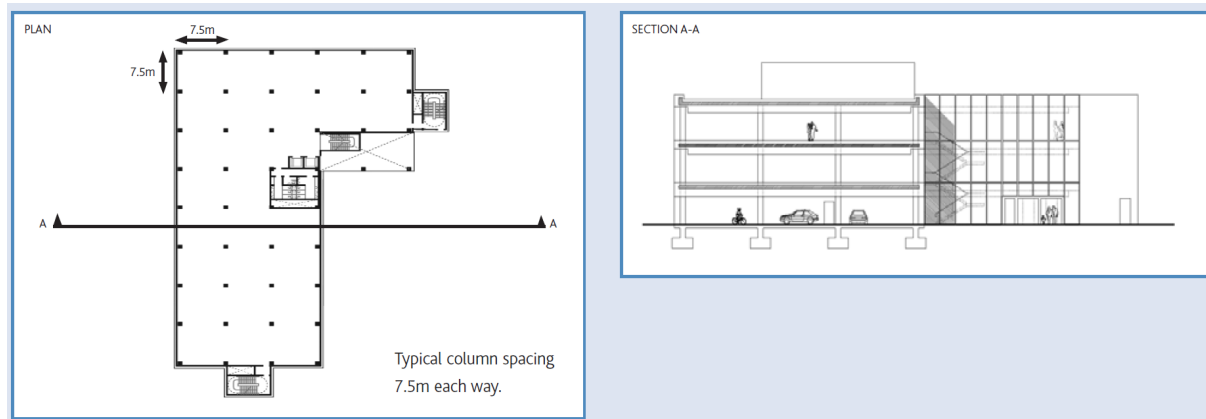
Floor plan and section for Building A (The Concrete Centre, 2008a)
